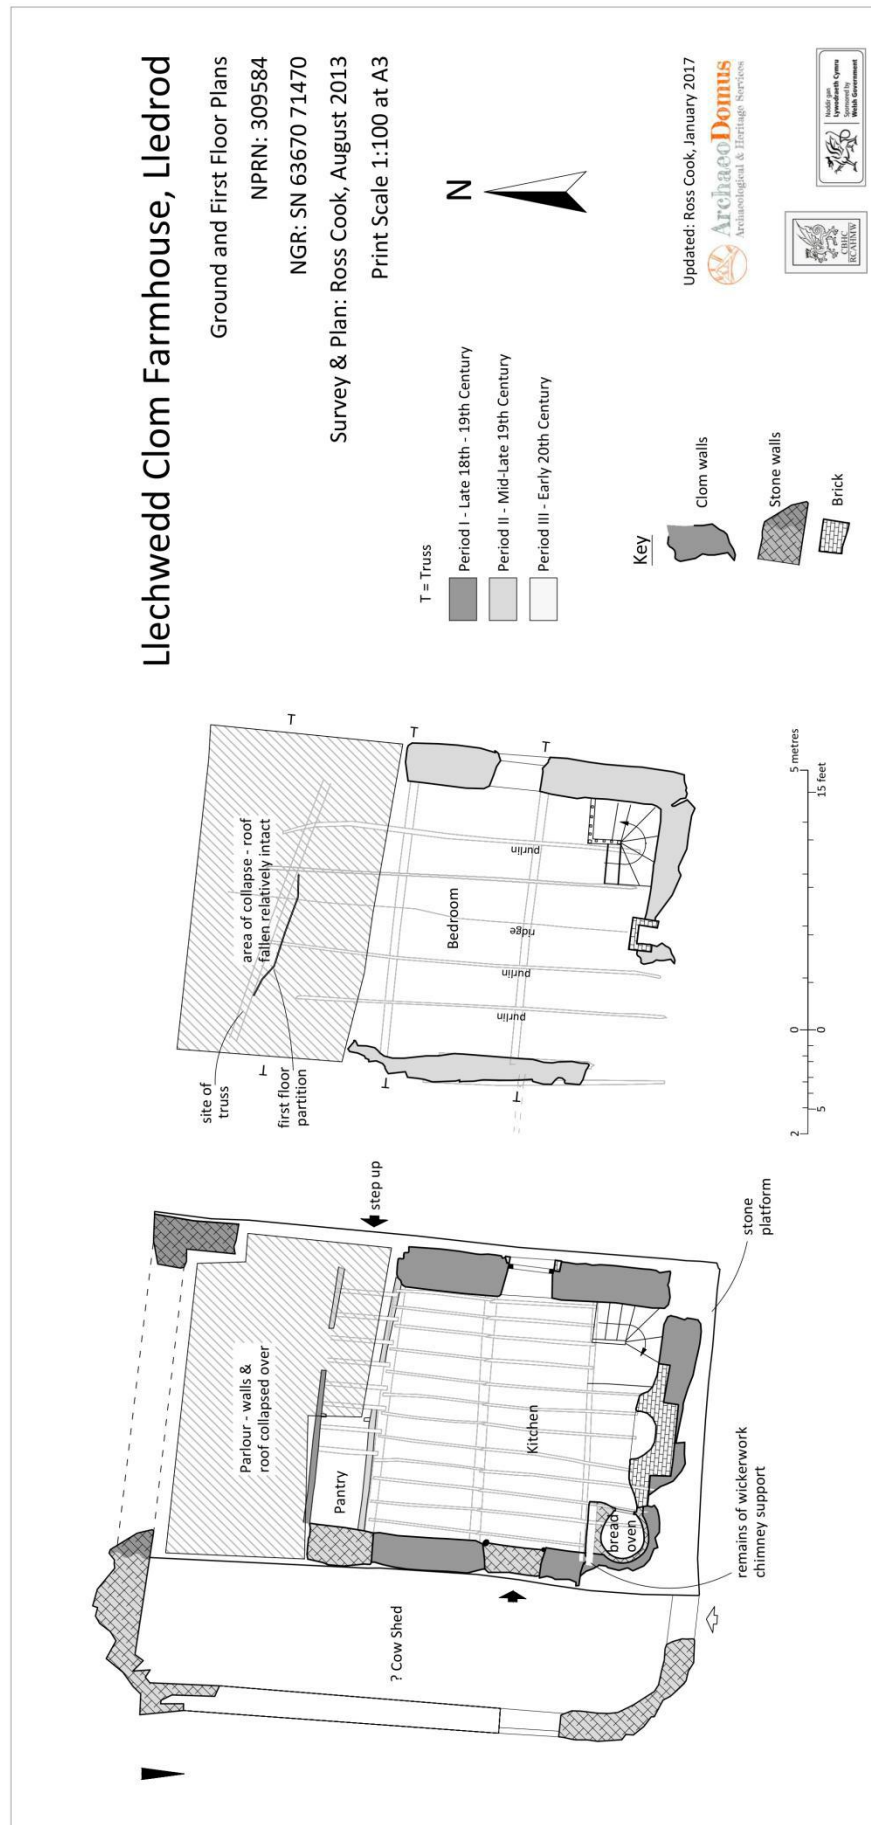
Survey Plan of Llechwedd Farmhouse.
